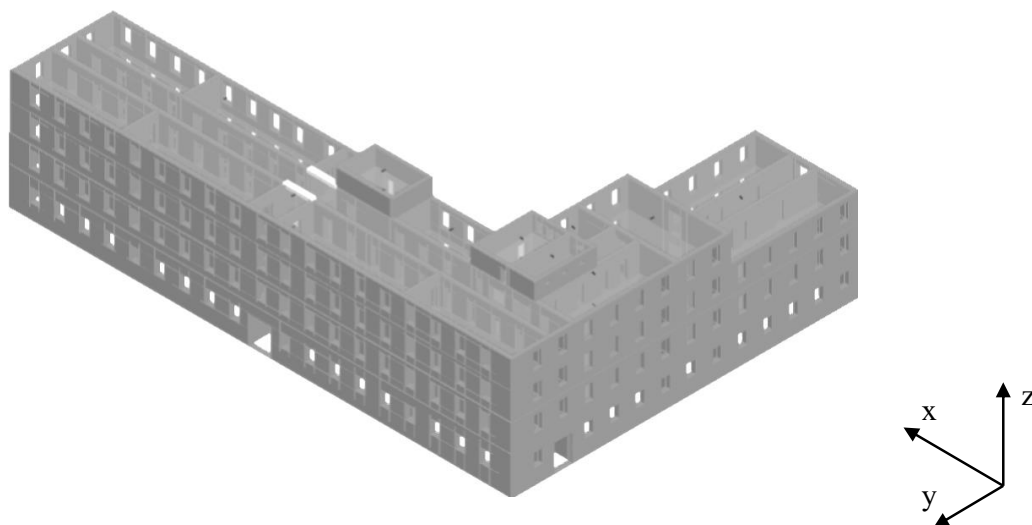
The existing masonry building considered. View of the 3D model made in [17].
